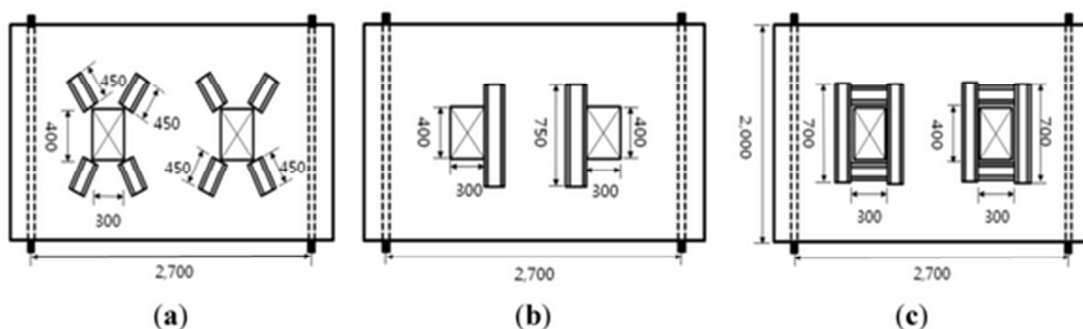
Different configurations of (a) diagonal (b) parallel and (c) surrounding strengthening with GFRP of slab opening
